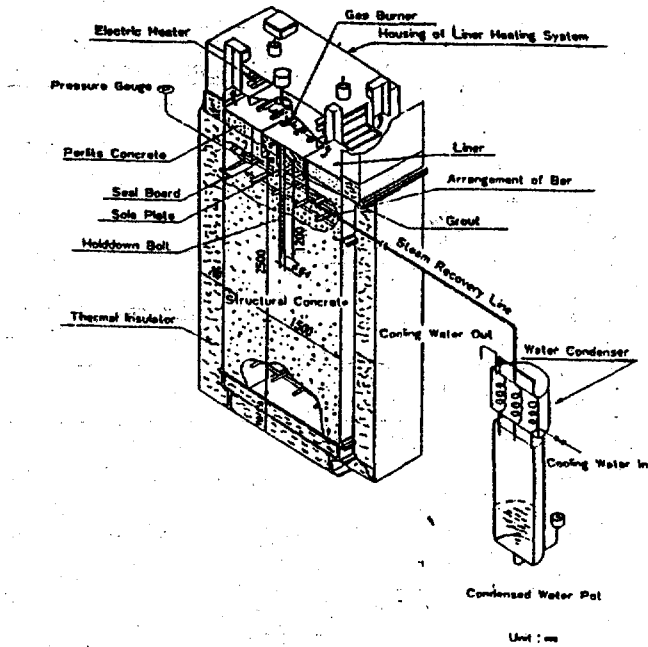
Test Section for Thermal Conduction of Steel Lined Concrete
